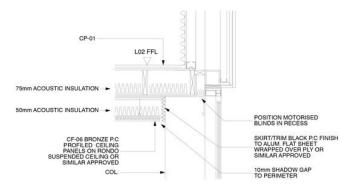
Detail construction drawing of BWSA shows 75mm acoustic insulation attached to the structure(Retrievedfrom:https://www.archdaily.com/787627/rmit-bundoora-west-student-accommodation-rma?ad_medium=gallery)
